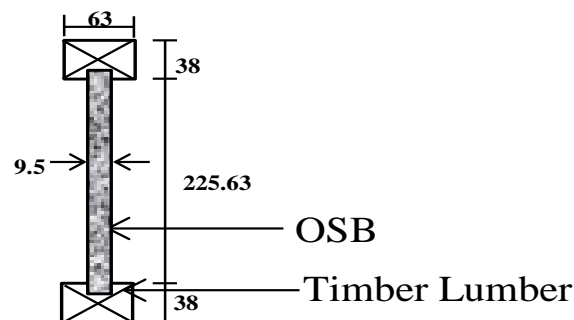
Cross Section of Tested I-Joists (Dimensions are in mm)
